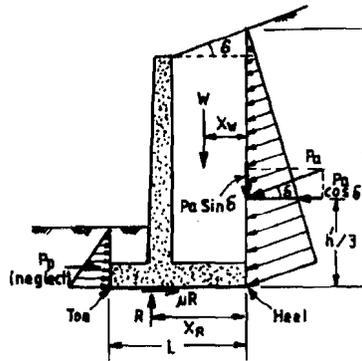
Forces Acting on a Cantilever Retaining Wall
